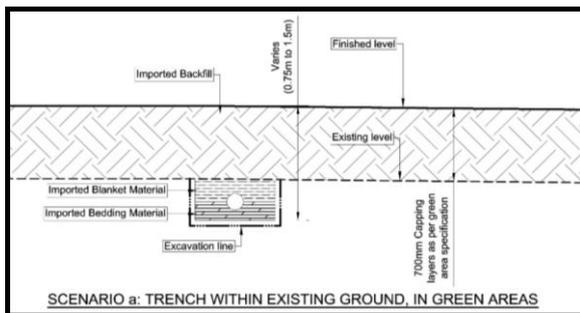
Scenario A: Services- Trench within existing ground (Green Areas) (source: Walters, 2020)
